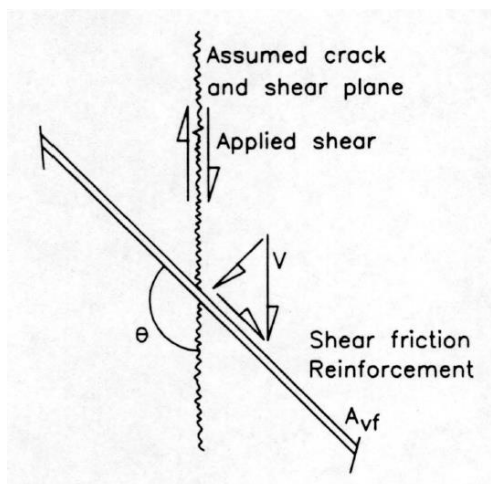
Shear-friction reinforcement inclined to the shear plane, Mattock (1974)
